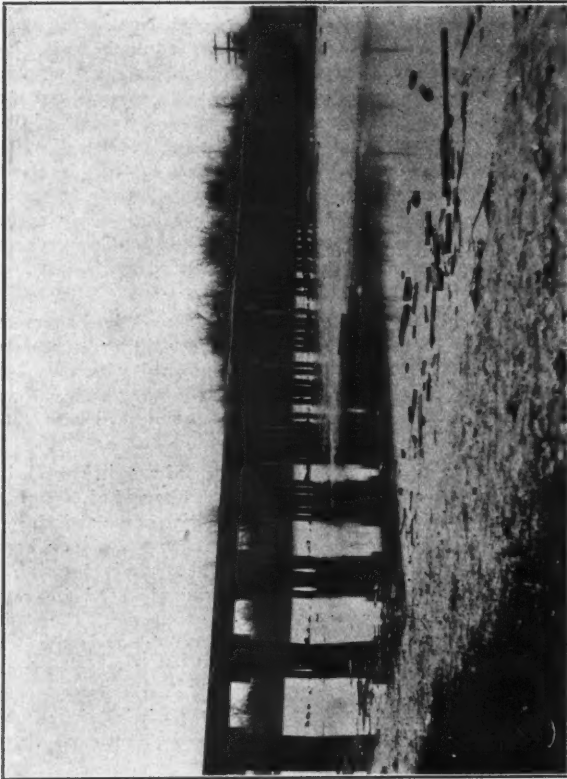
Concrete Pile Trestle, C., B. & Q. R. R.
